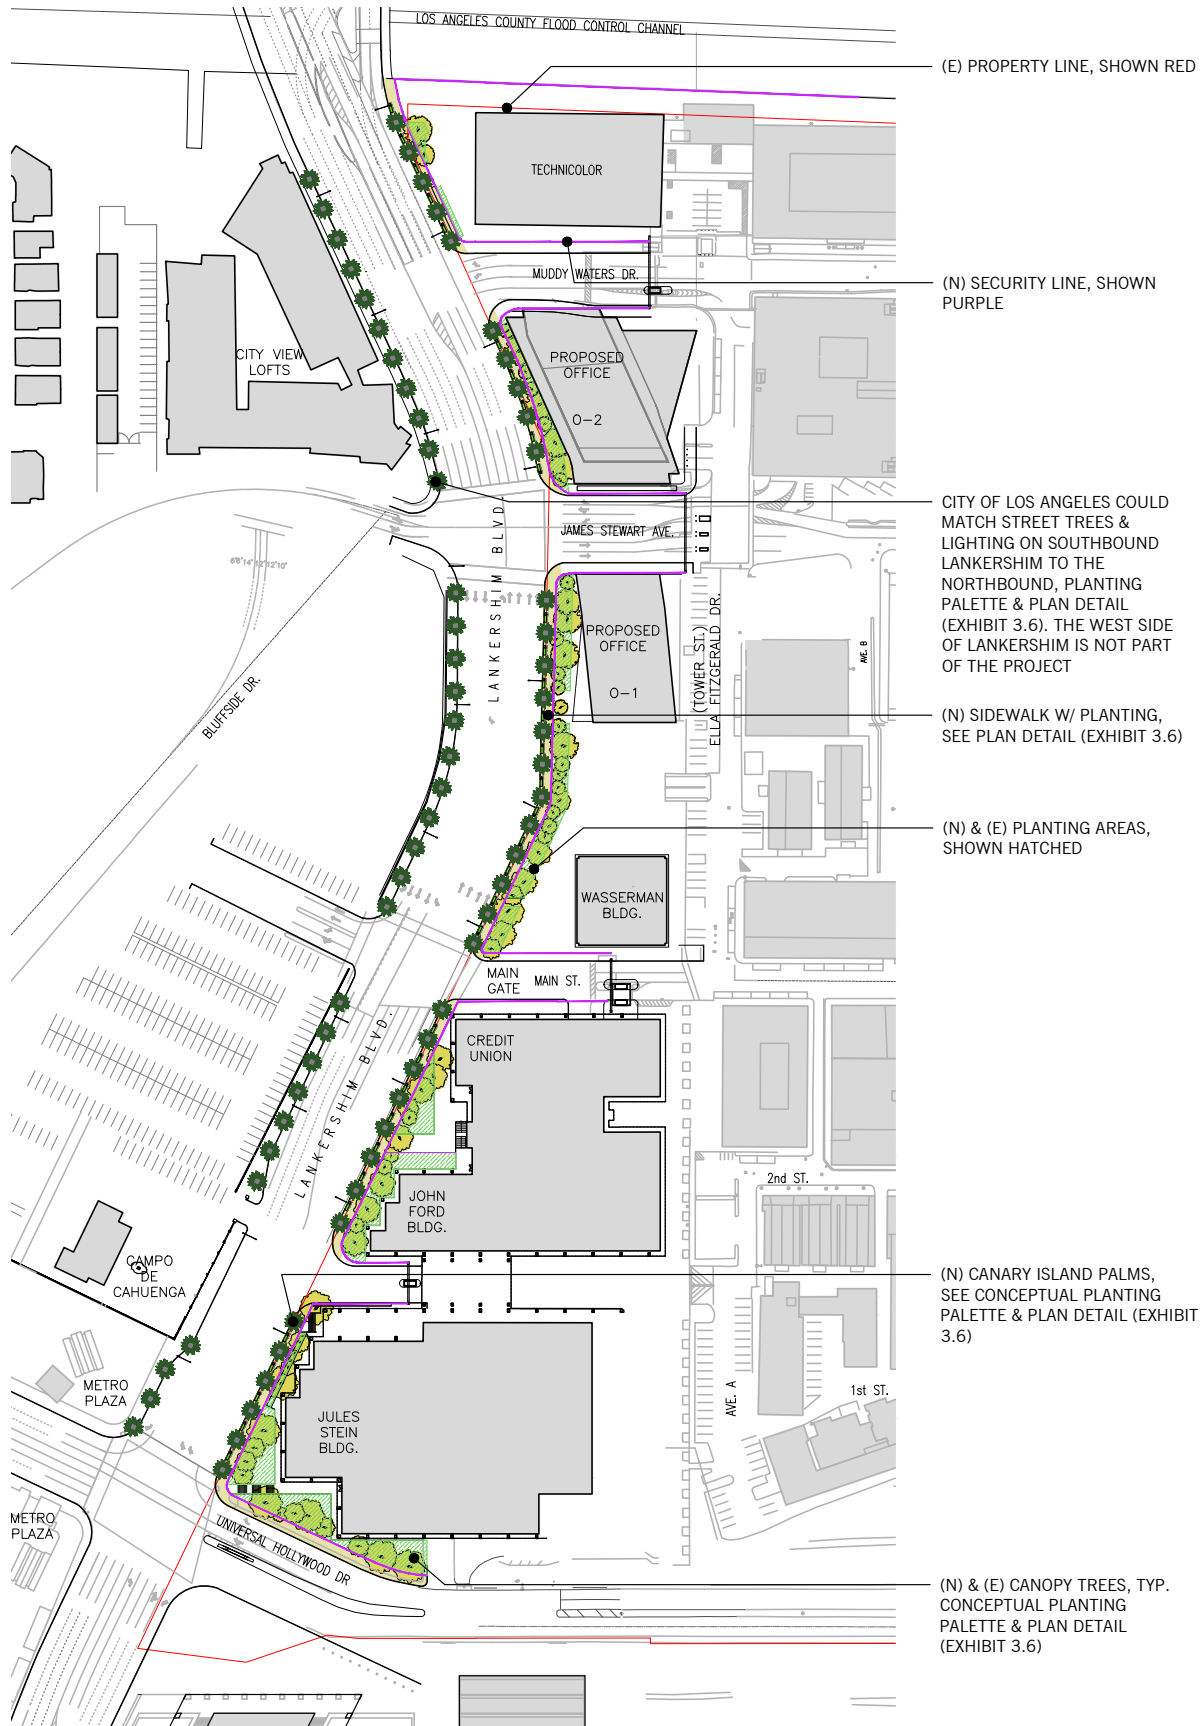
Conceptual Lankershim Streetscape Plan
